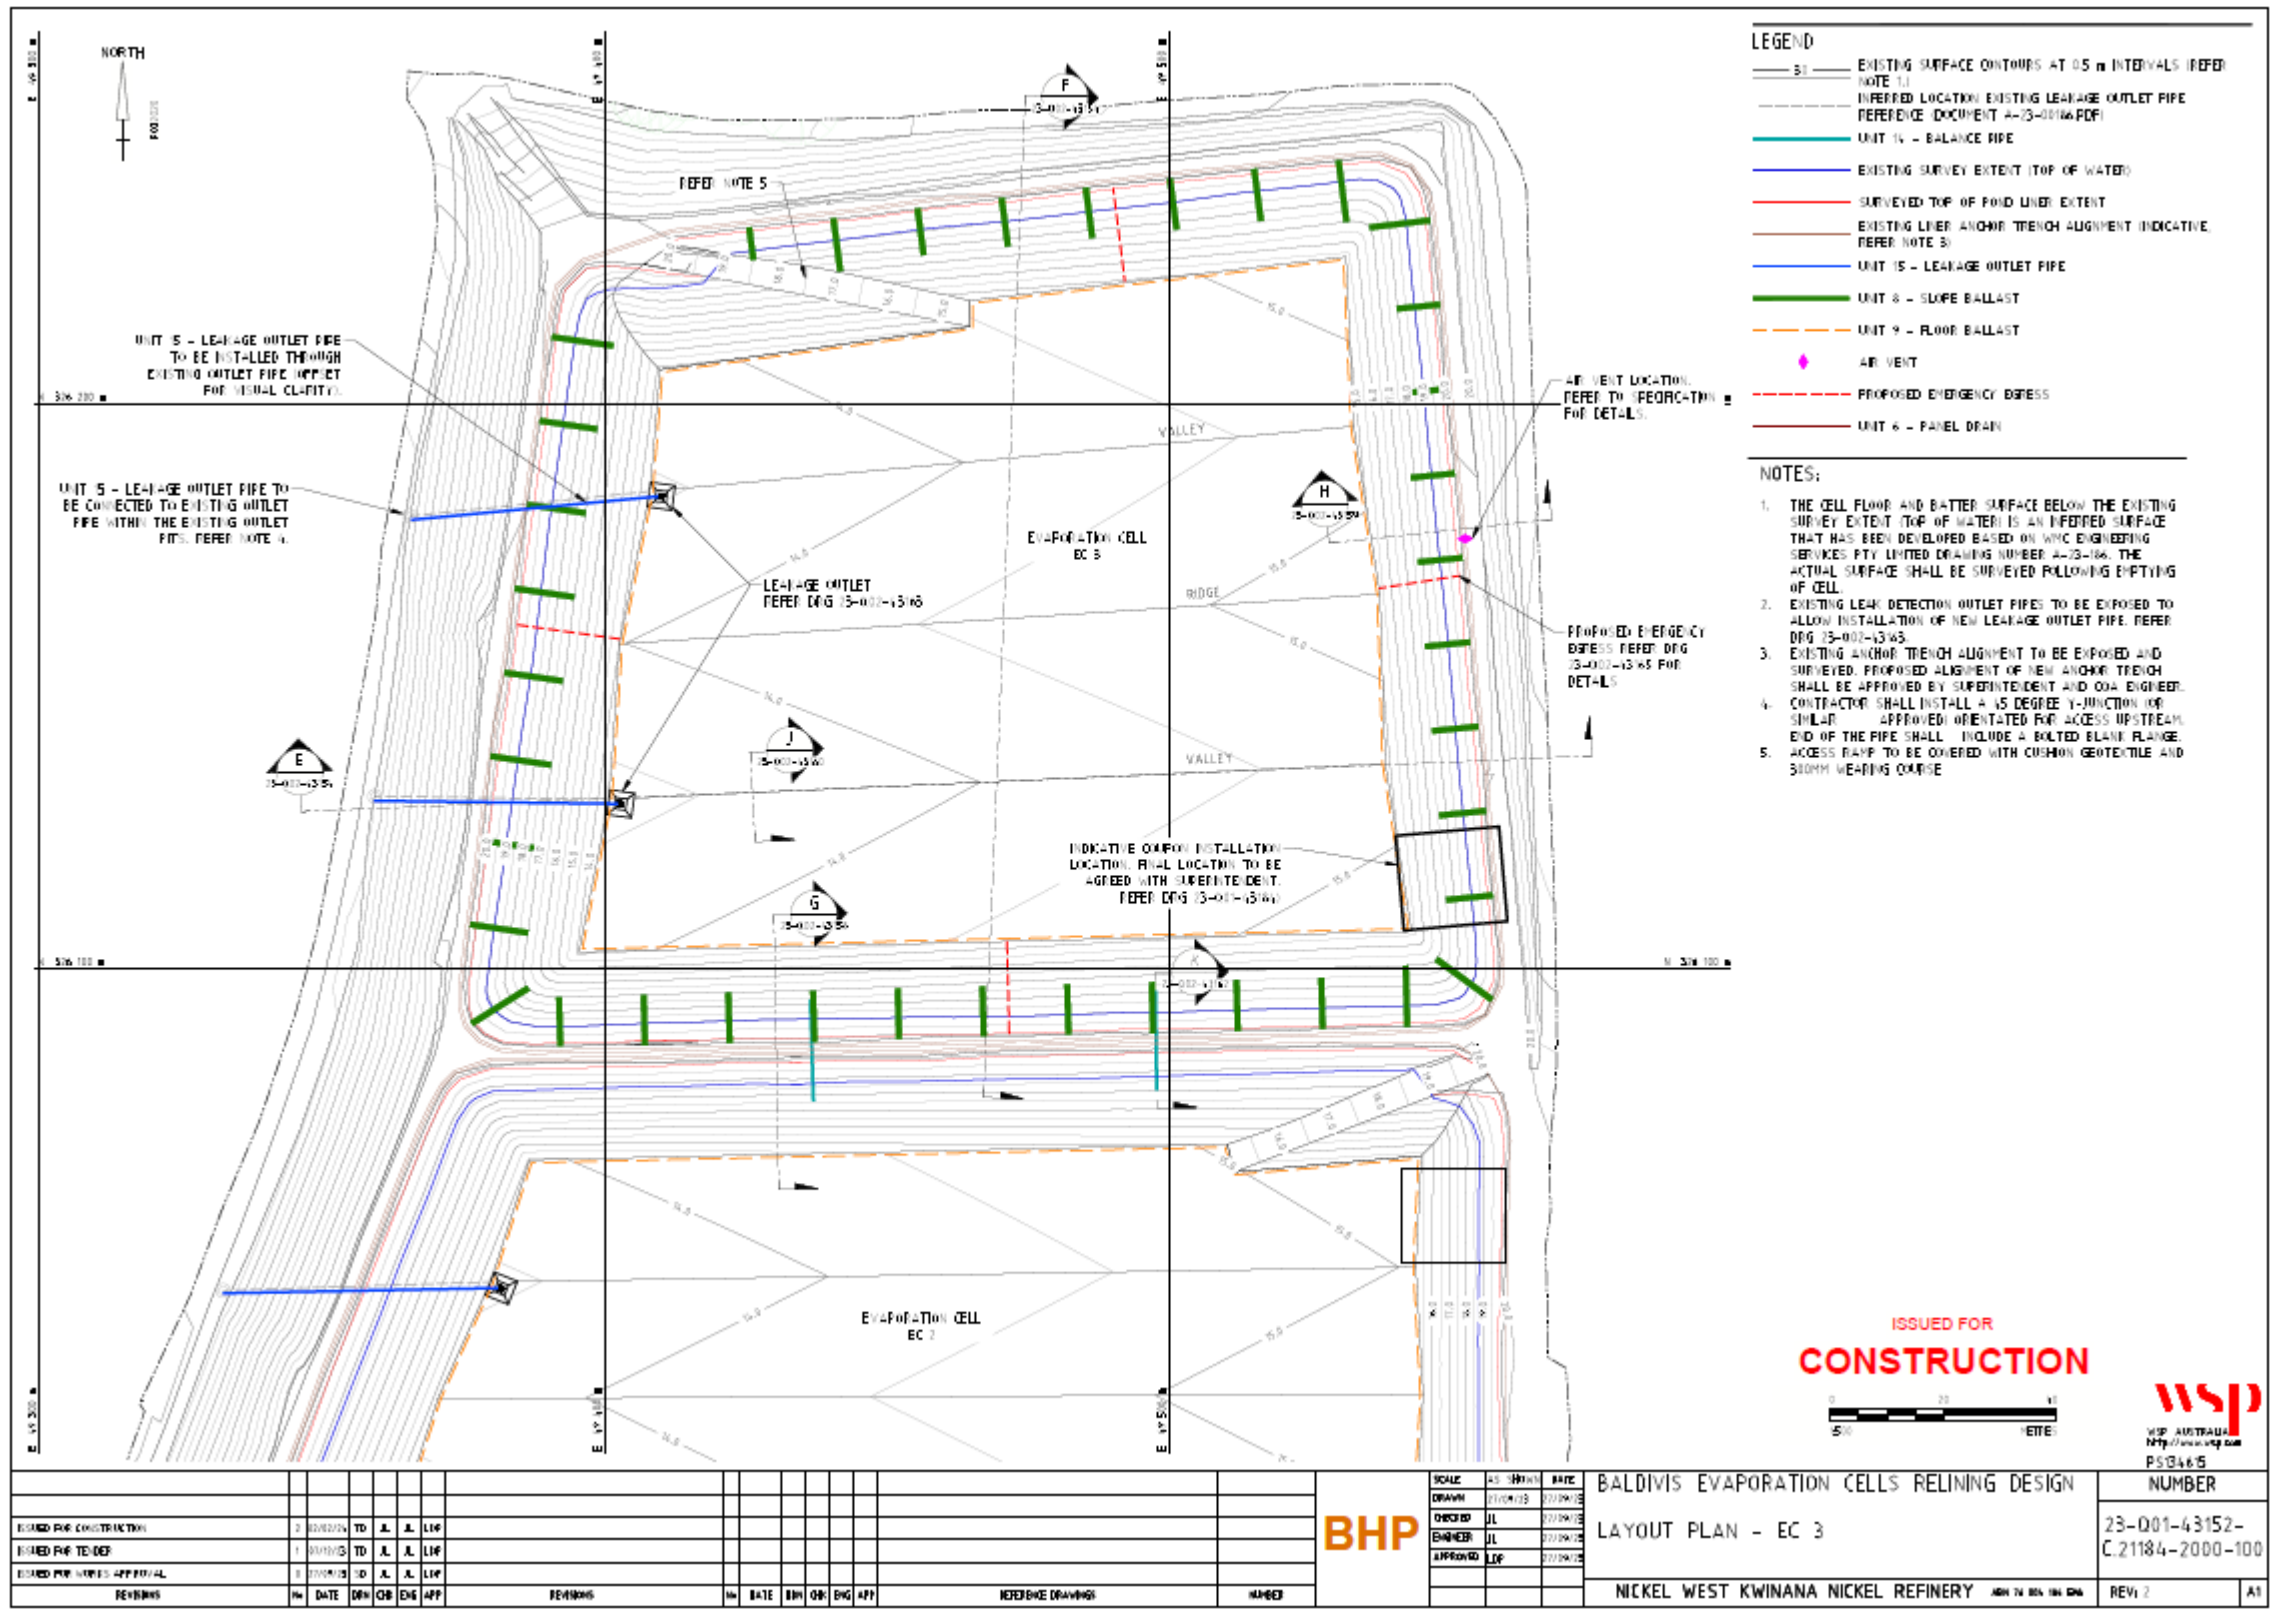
Layout plan for evaporation cell 3 showing access ramp and floor gradient valleys towards leakage outlet pipes
